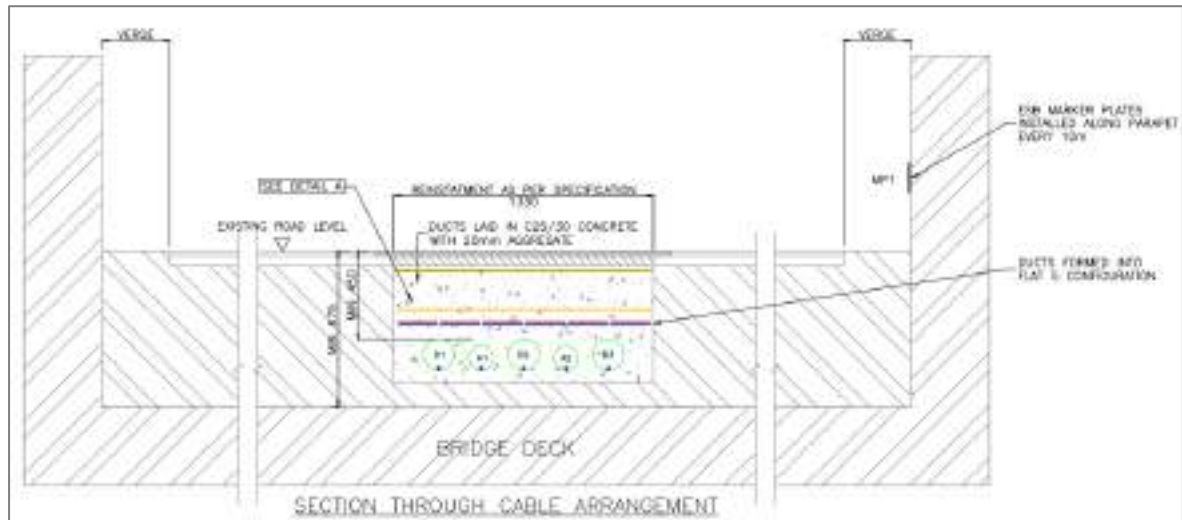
EirGrid standard bridge crossing detail, ducting laid within the carriageway
